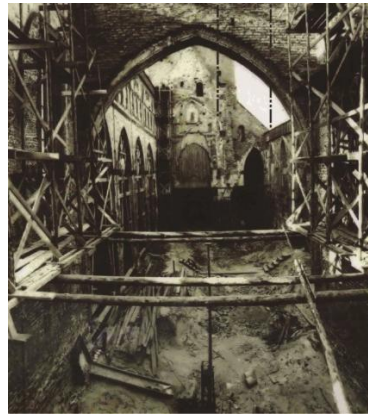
B. Picture of the underpinning corridor at Helen Street. All the concrete piers were jacked.
